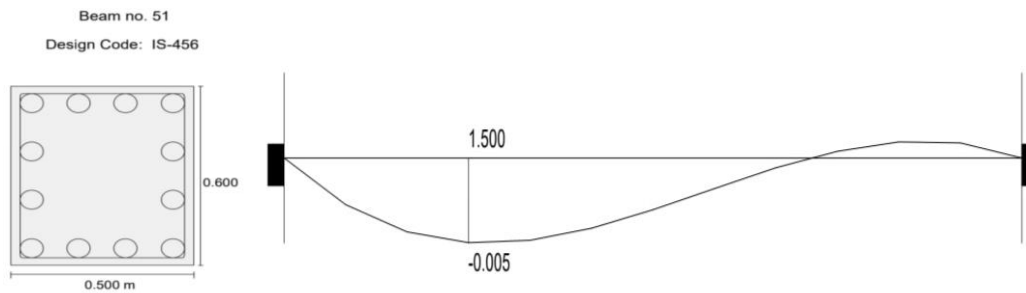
Detailing of Column Reinforcement & Deflection in Local Z direction Local case 20
